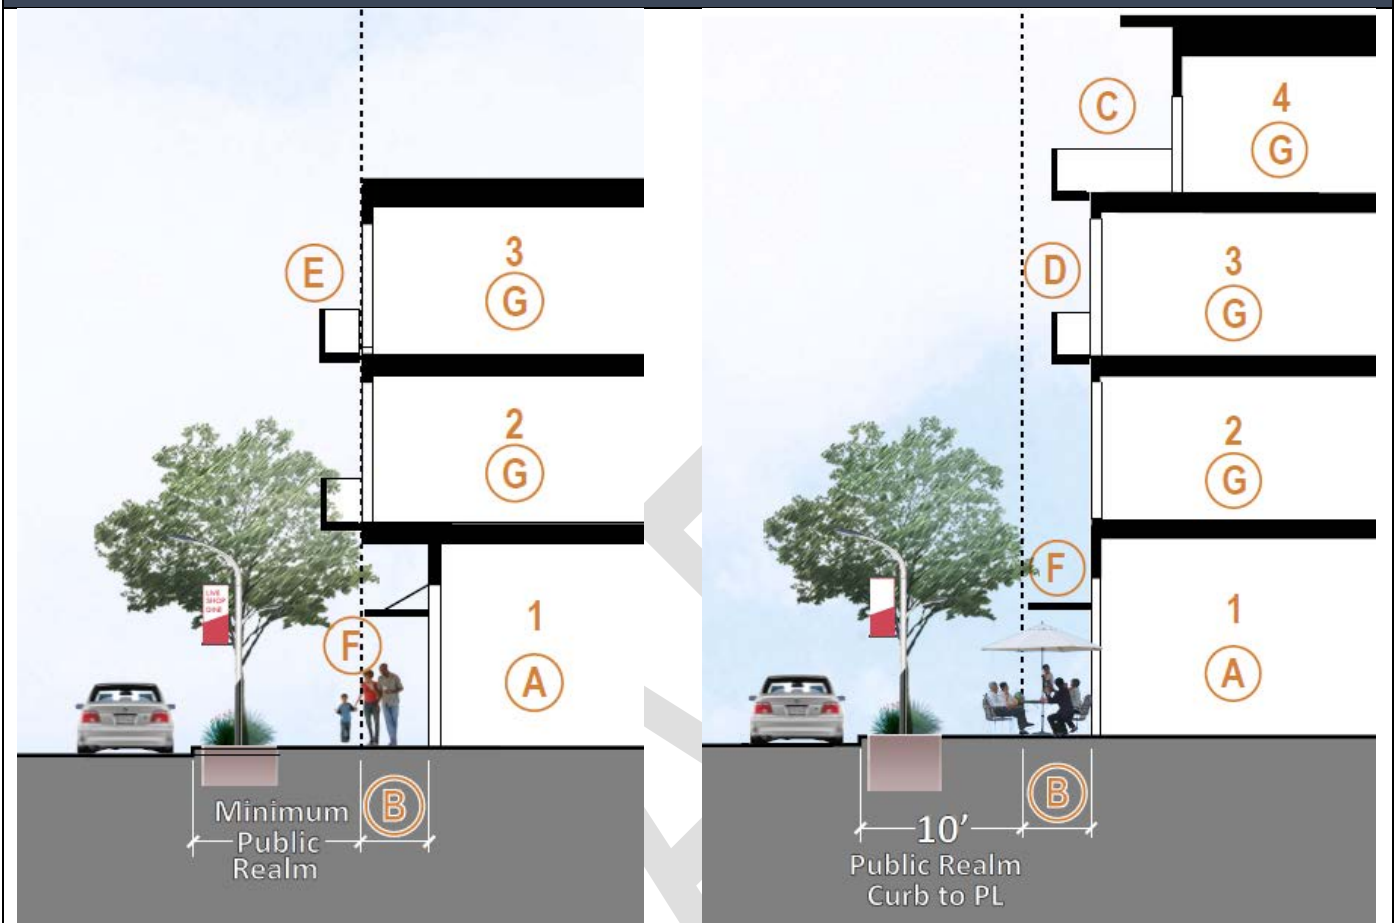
Building Placement & Activation Diagram – Mixed-Use Residential & Residential
